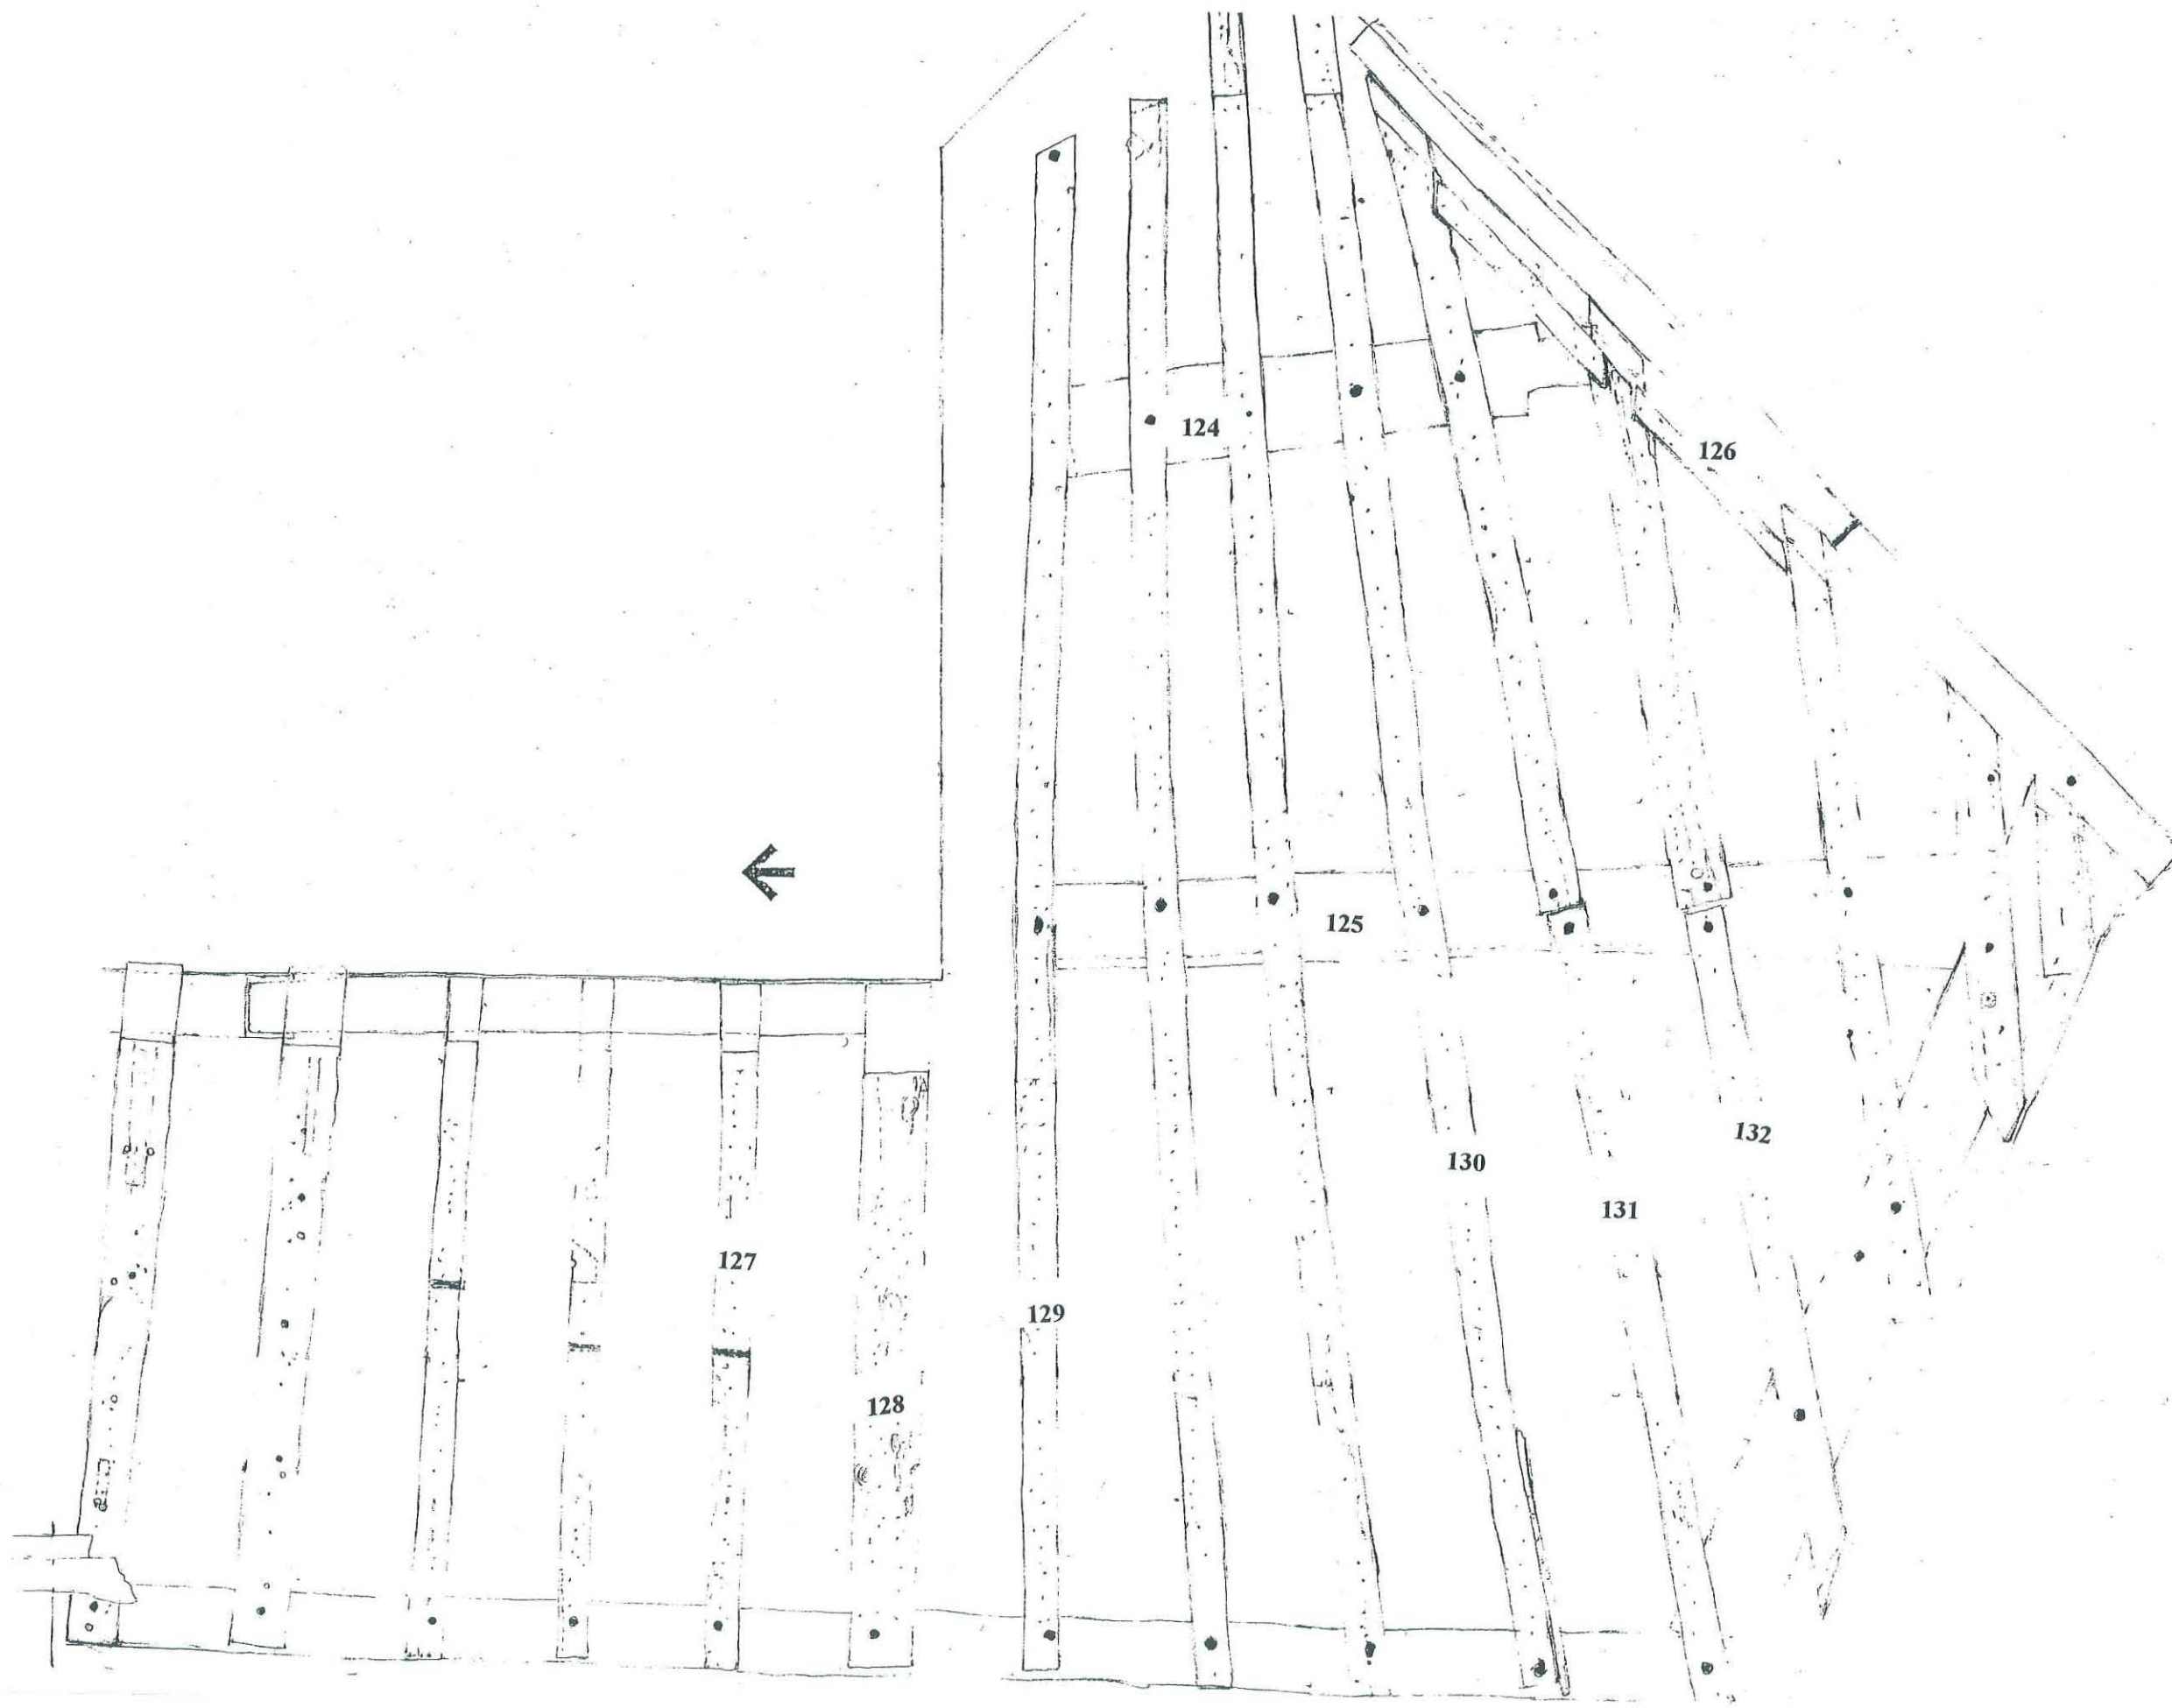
Plan showing the positions of the core samples from the structural timbers of the connecting roof
